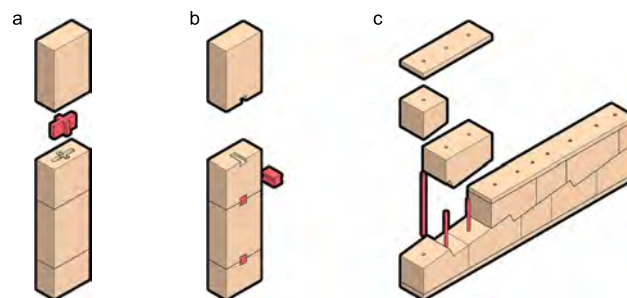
Concept of the linear elements: a) Column with cross-tenon joints, b) Column with spline joints, c) Composite indented beam with dowel joints.
